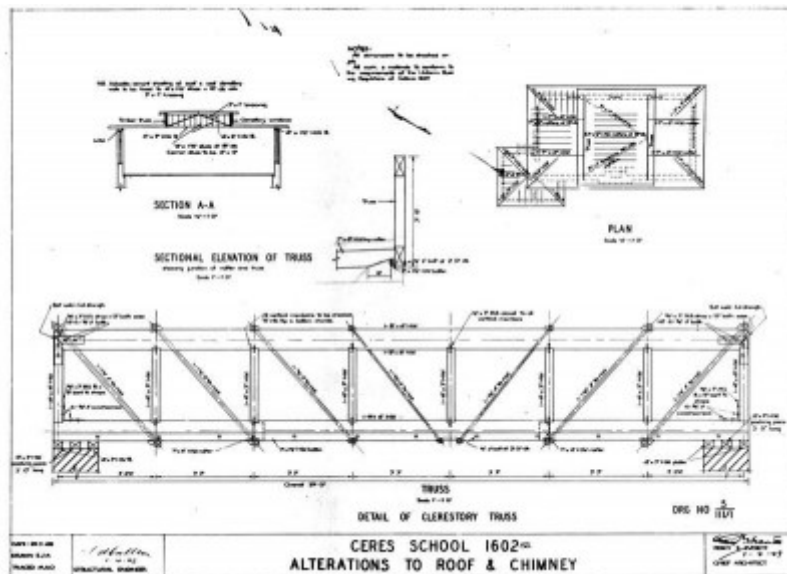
P. Everett, Proposed Alterations to Ceres School ? Roof Plan, Section & Detail of Clerestory Truss, 1 April 1949, Source: Drawing SS 1602.52, Public Record Office Victoria
